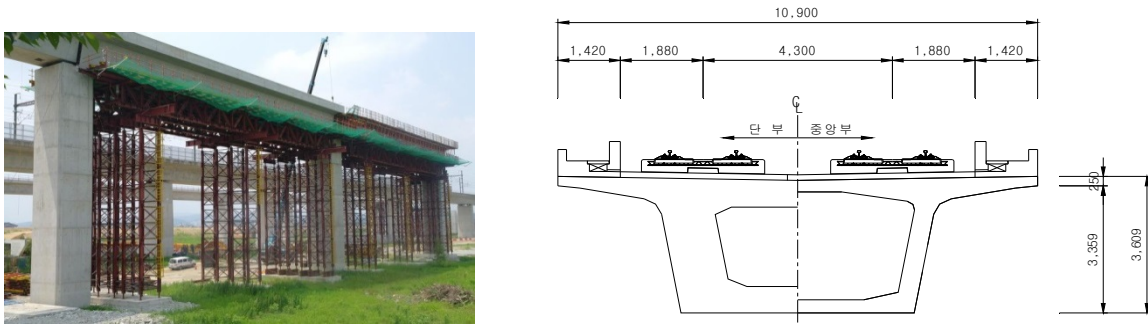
View of installation about P.S.C Box girder (Using F.S.M)
